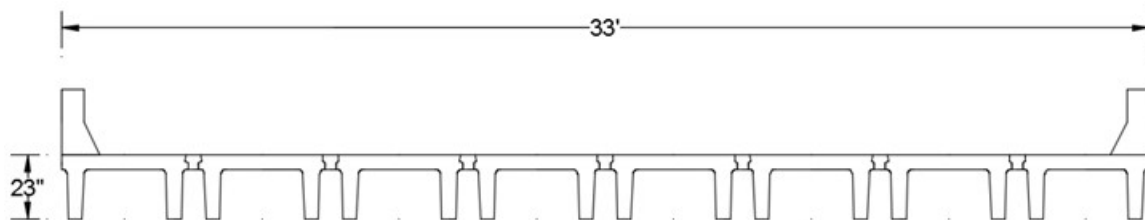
Cross Section of Hypothetical Bridge for Sizing the “Proposed” Specimen
